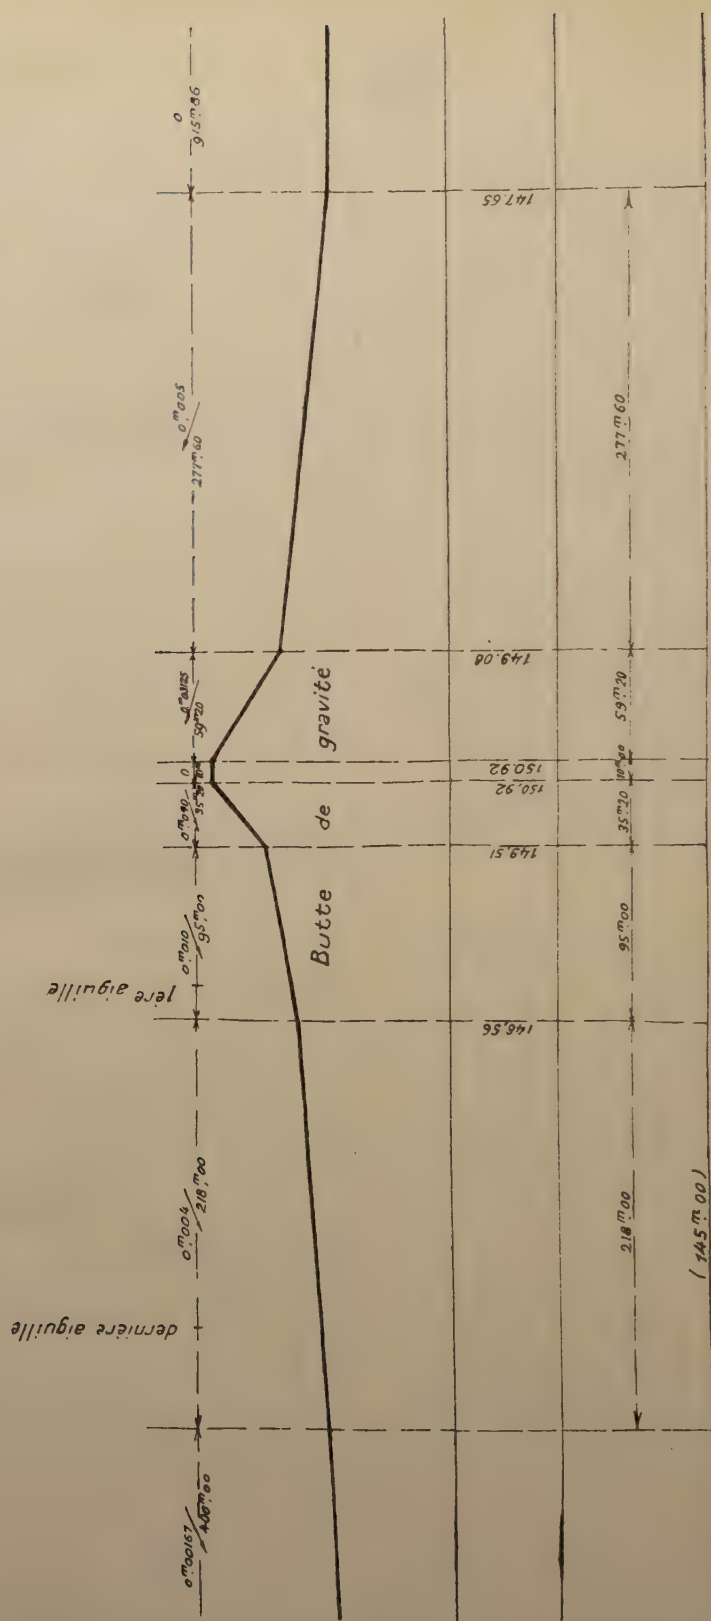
Hausbergen Marshalling Yard. Longitudinal section.
